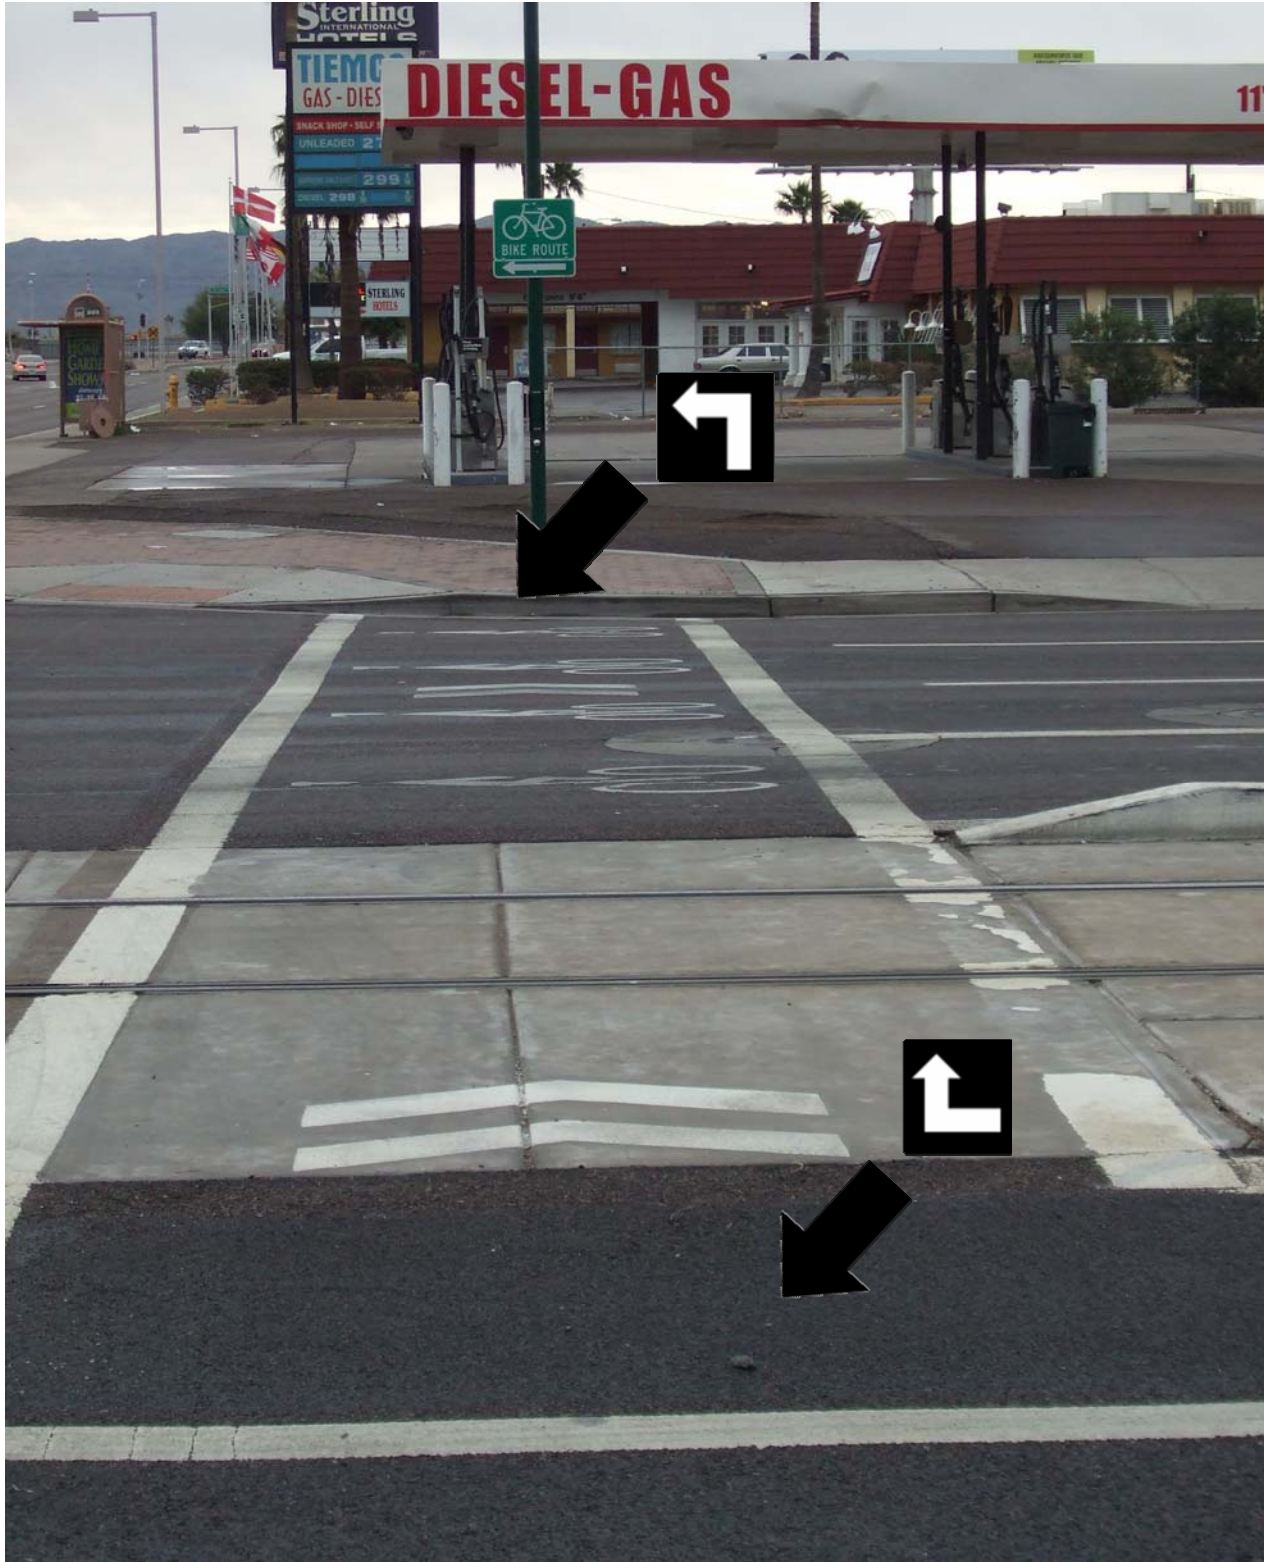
24<sup>th</sup> Street and Jefferson Street – Recommended Traffic Control
